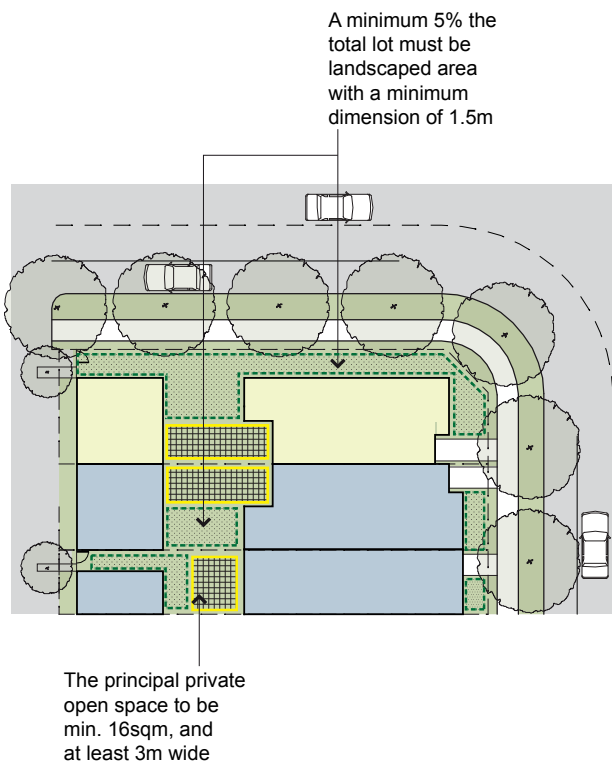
Minimum landscaped area and private open space requirements for terraces
